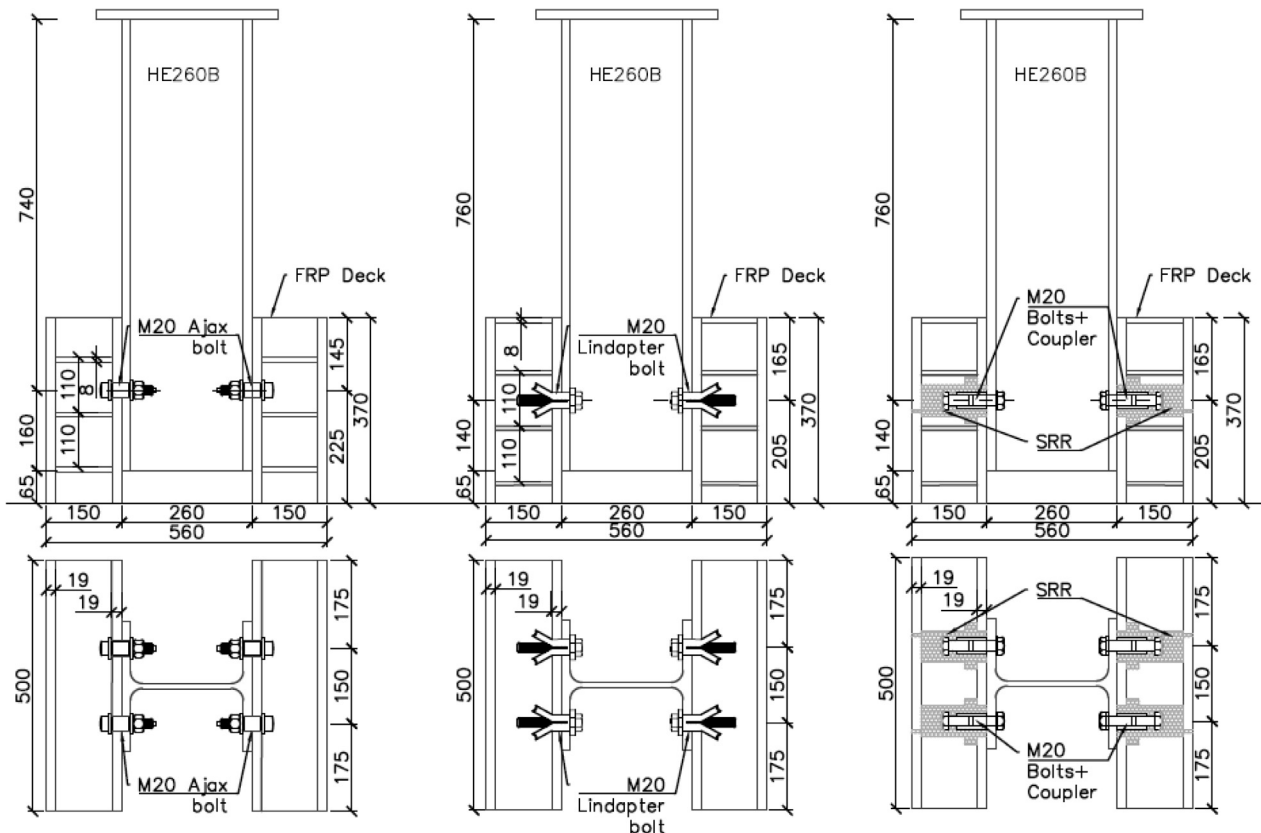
Push-out specimens: Ajax, Lindapter, injected SRR connectors.
